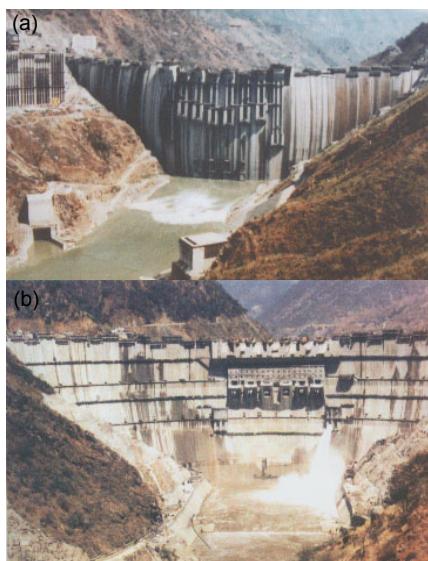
Elevation views of the upstream (a) and downstream (b) of the Ertan Hydropower Station Arch Dam
